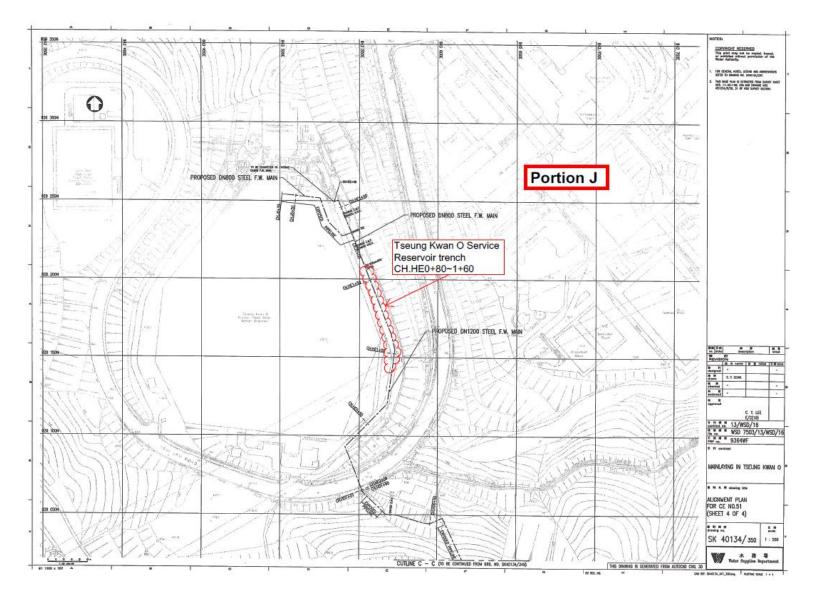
Location Plan for Portion J – CE.HE0+80~1+60
